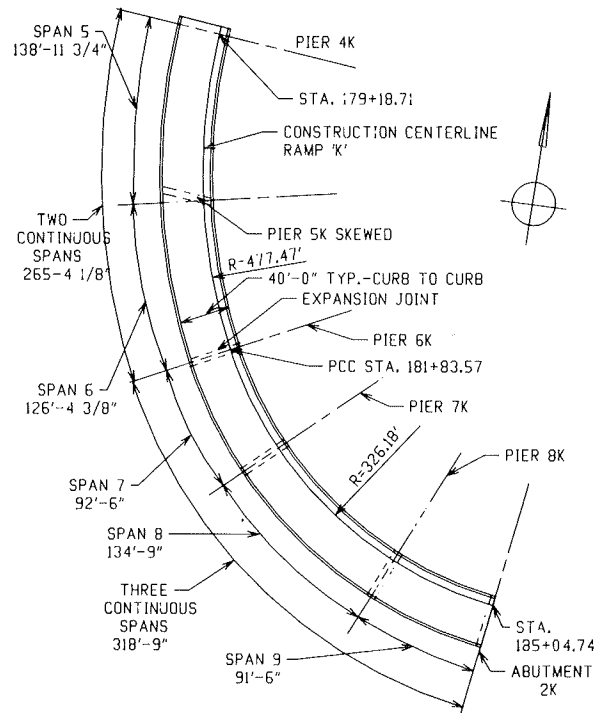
General layout of ramp K at Philadelphia International Airport.
